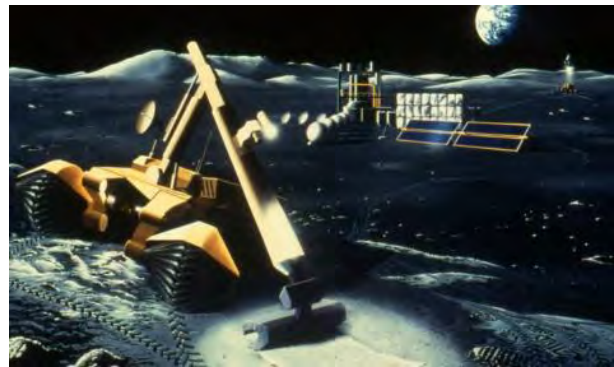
Next frontier for construction robotics: space stations and colonies (Photo: T. Bock)
